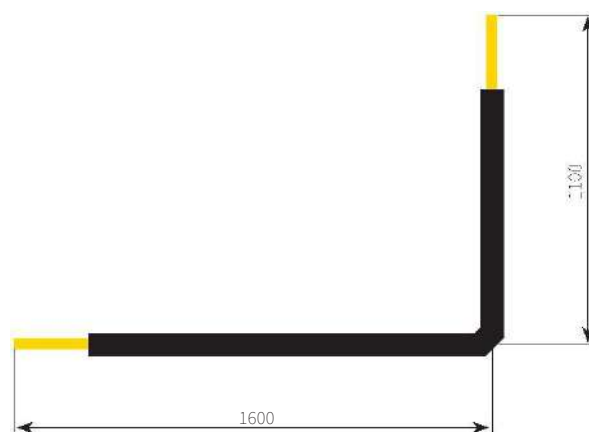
Measurements house entry bend DN 20 – DN 125 (mm)
